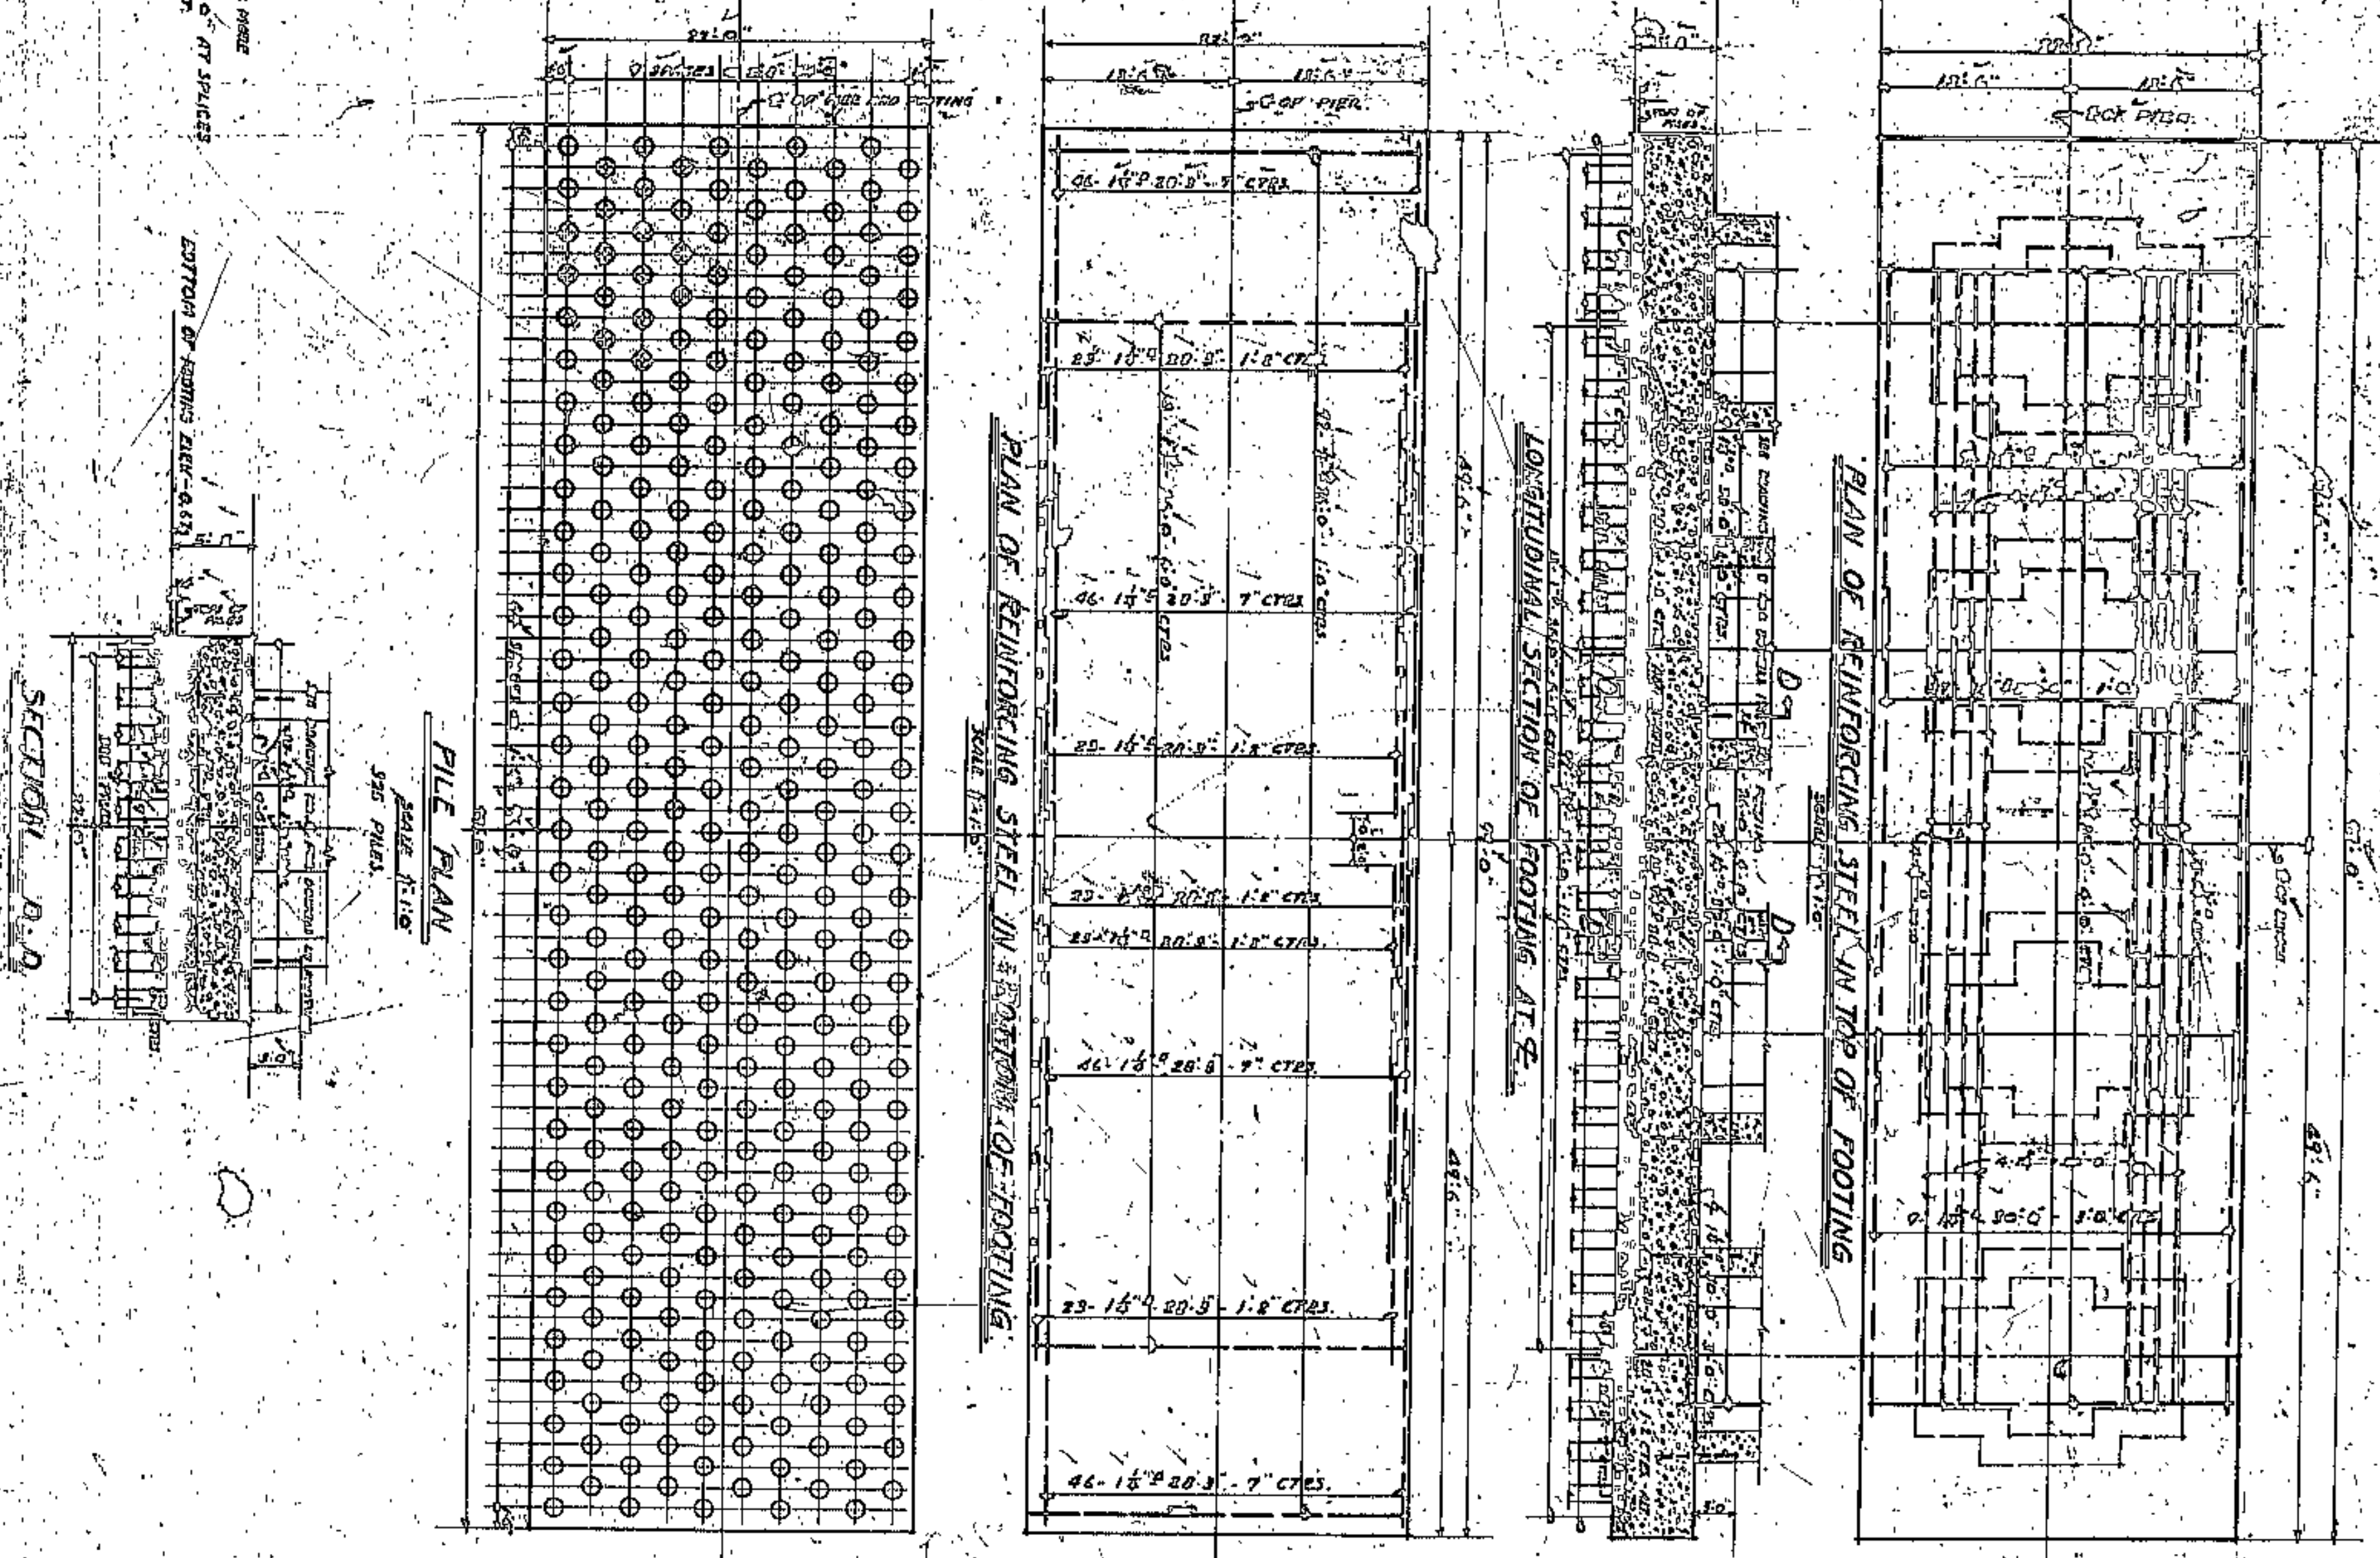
DETAILS OF FOOTINGS FOR PIERS NO. 7 AND 8.
